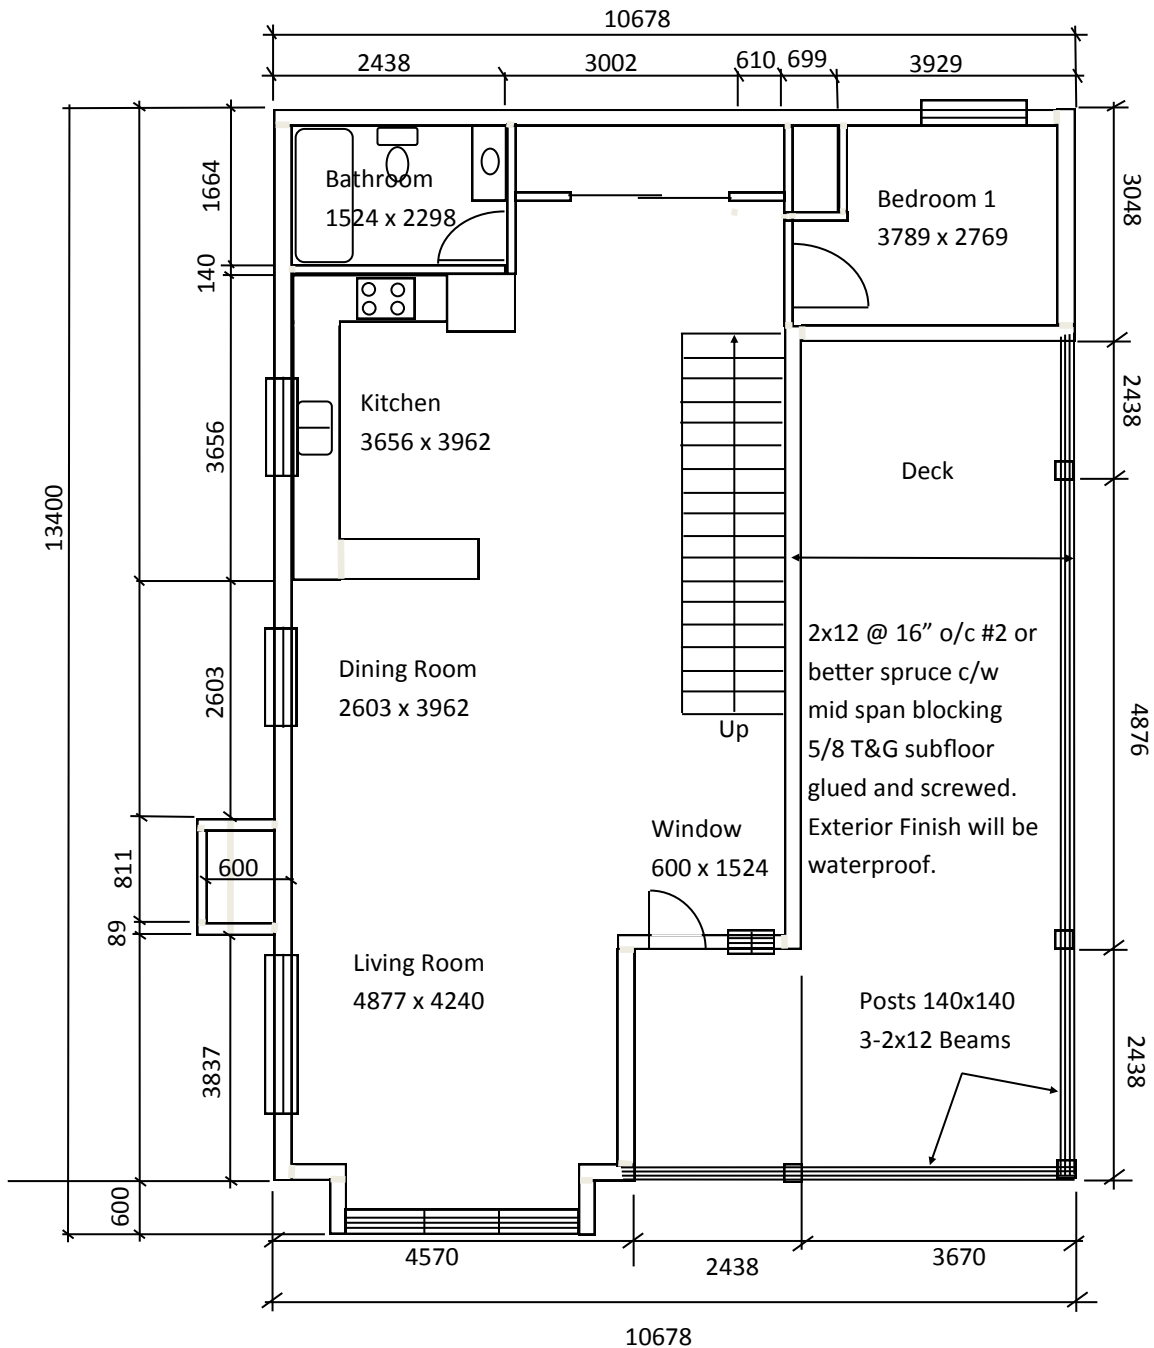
TYPICAL FLOOR PLAN EXAMPLE
